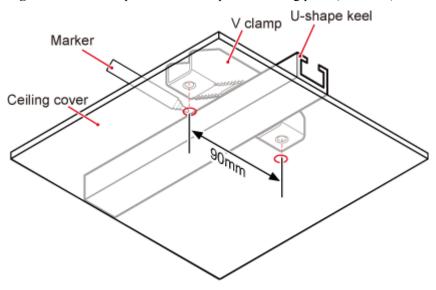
Anchor points on the suspended ceiling plate (unit: mm)
